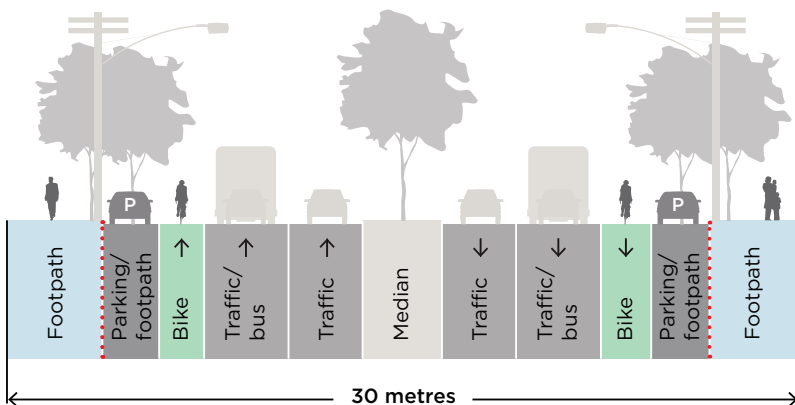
Potential typical street section for Spencer Street in the short term.
